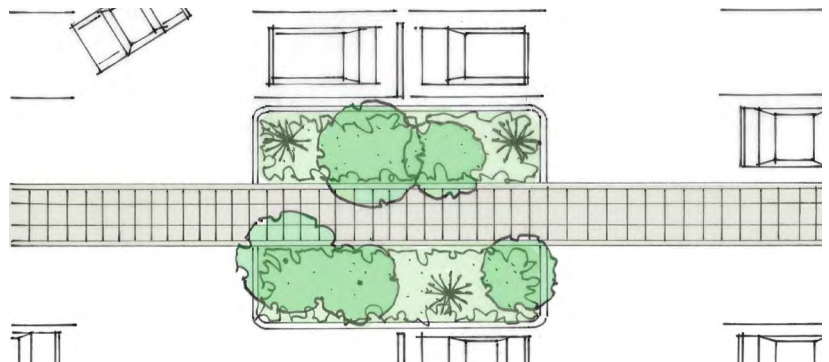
S3.b: 5-ft. wide parking walkway with scored concrete and landscaping.
